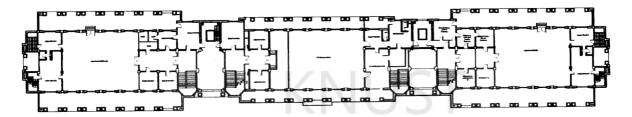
First Floor Plan, Supreme Court Building, Ghana.
